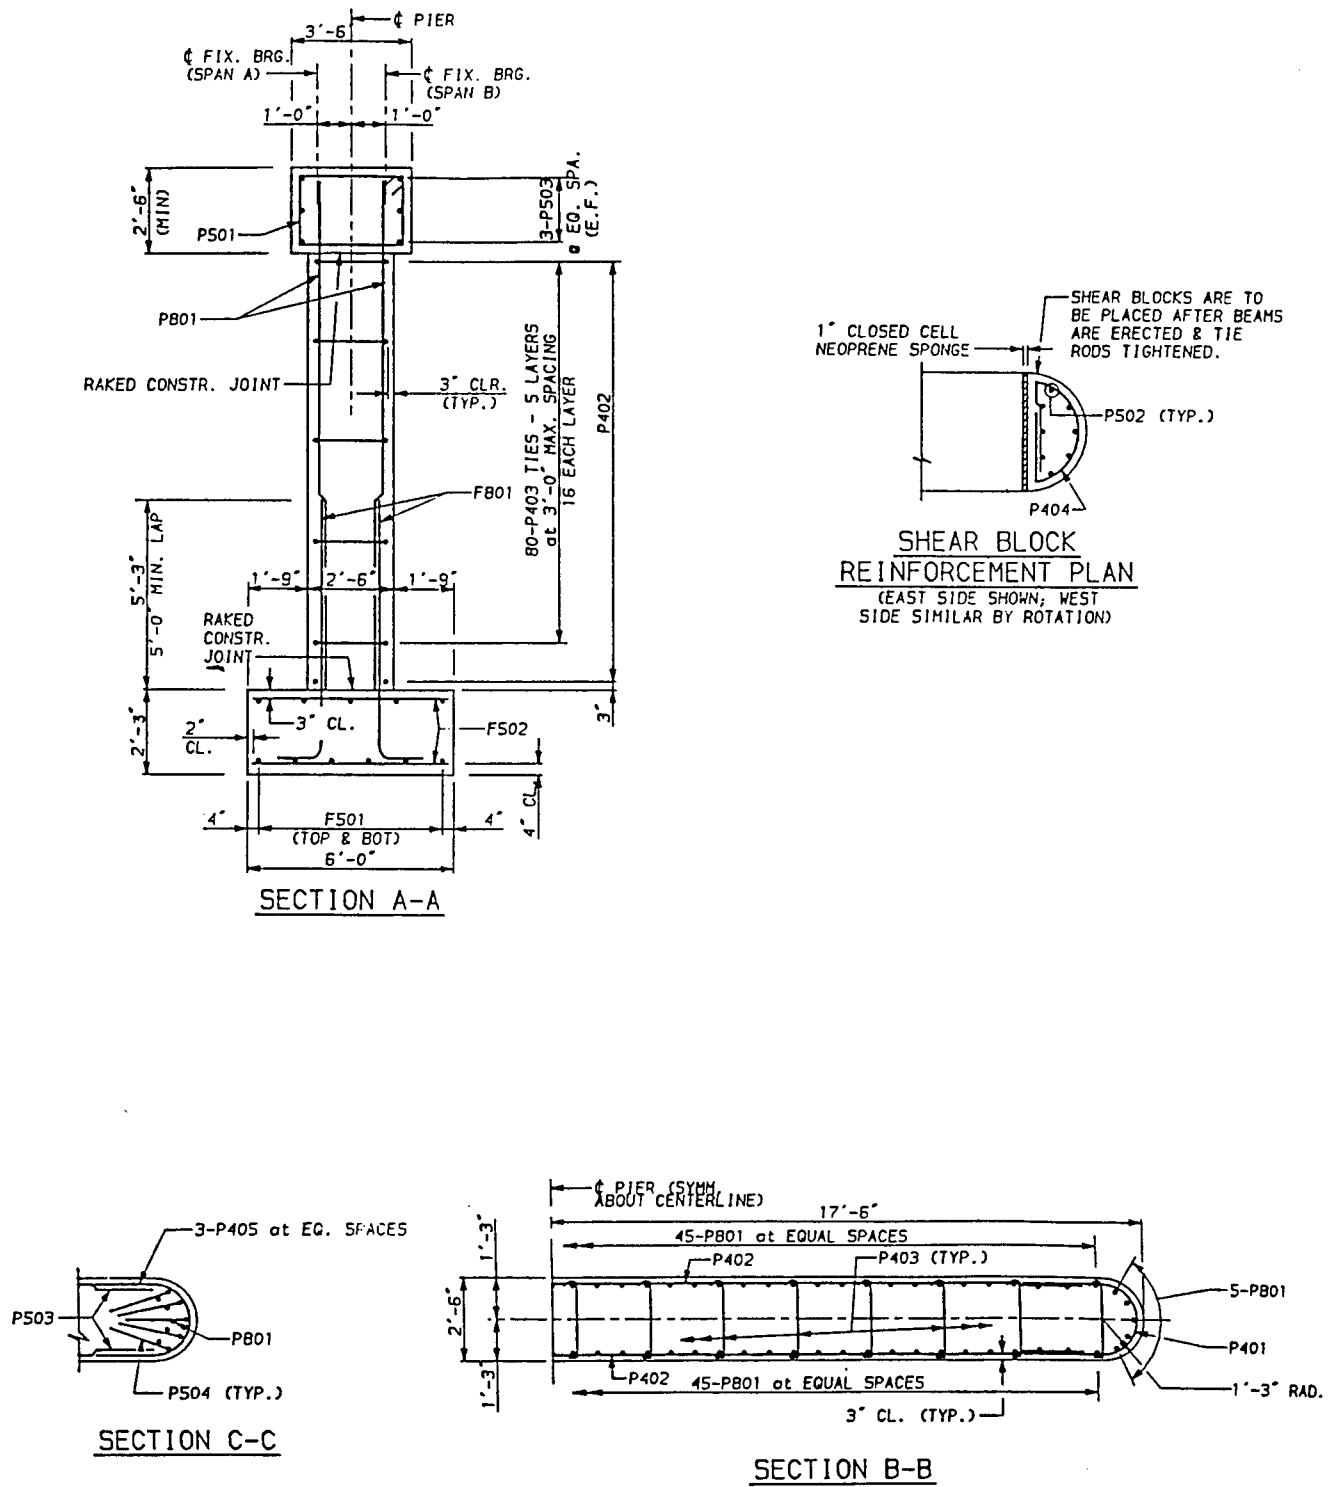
Pennsylvania Pier Wall with Hammerhead Details - Elevation
